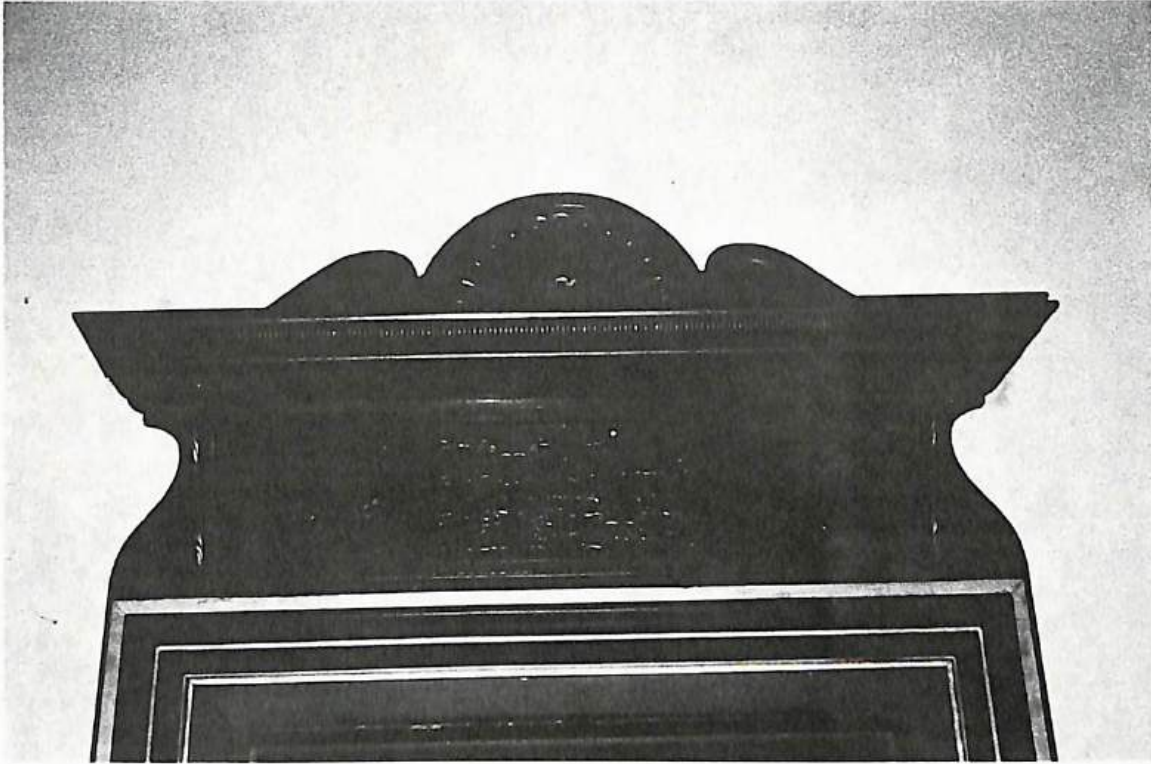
Overdoor in the Ground Floor Hall above the Dining Room Door. (PSD)
